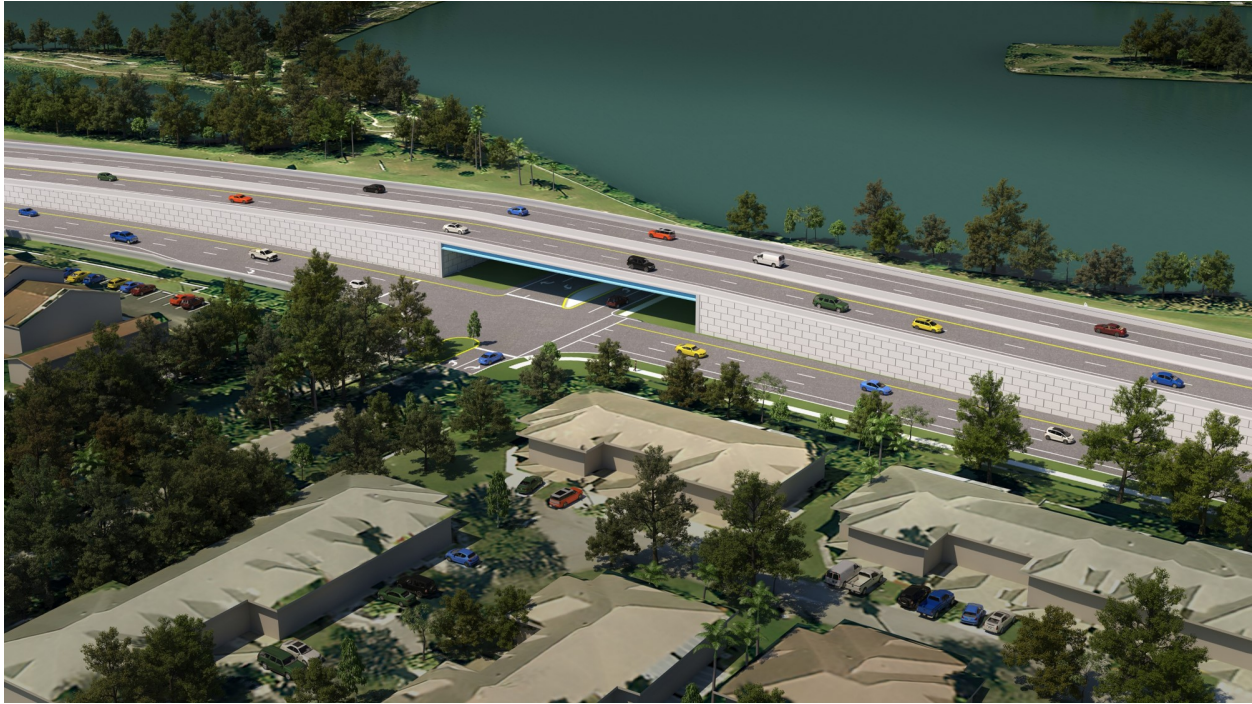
Center Alternative – Looking Southwest at Powerline Road
